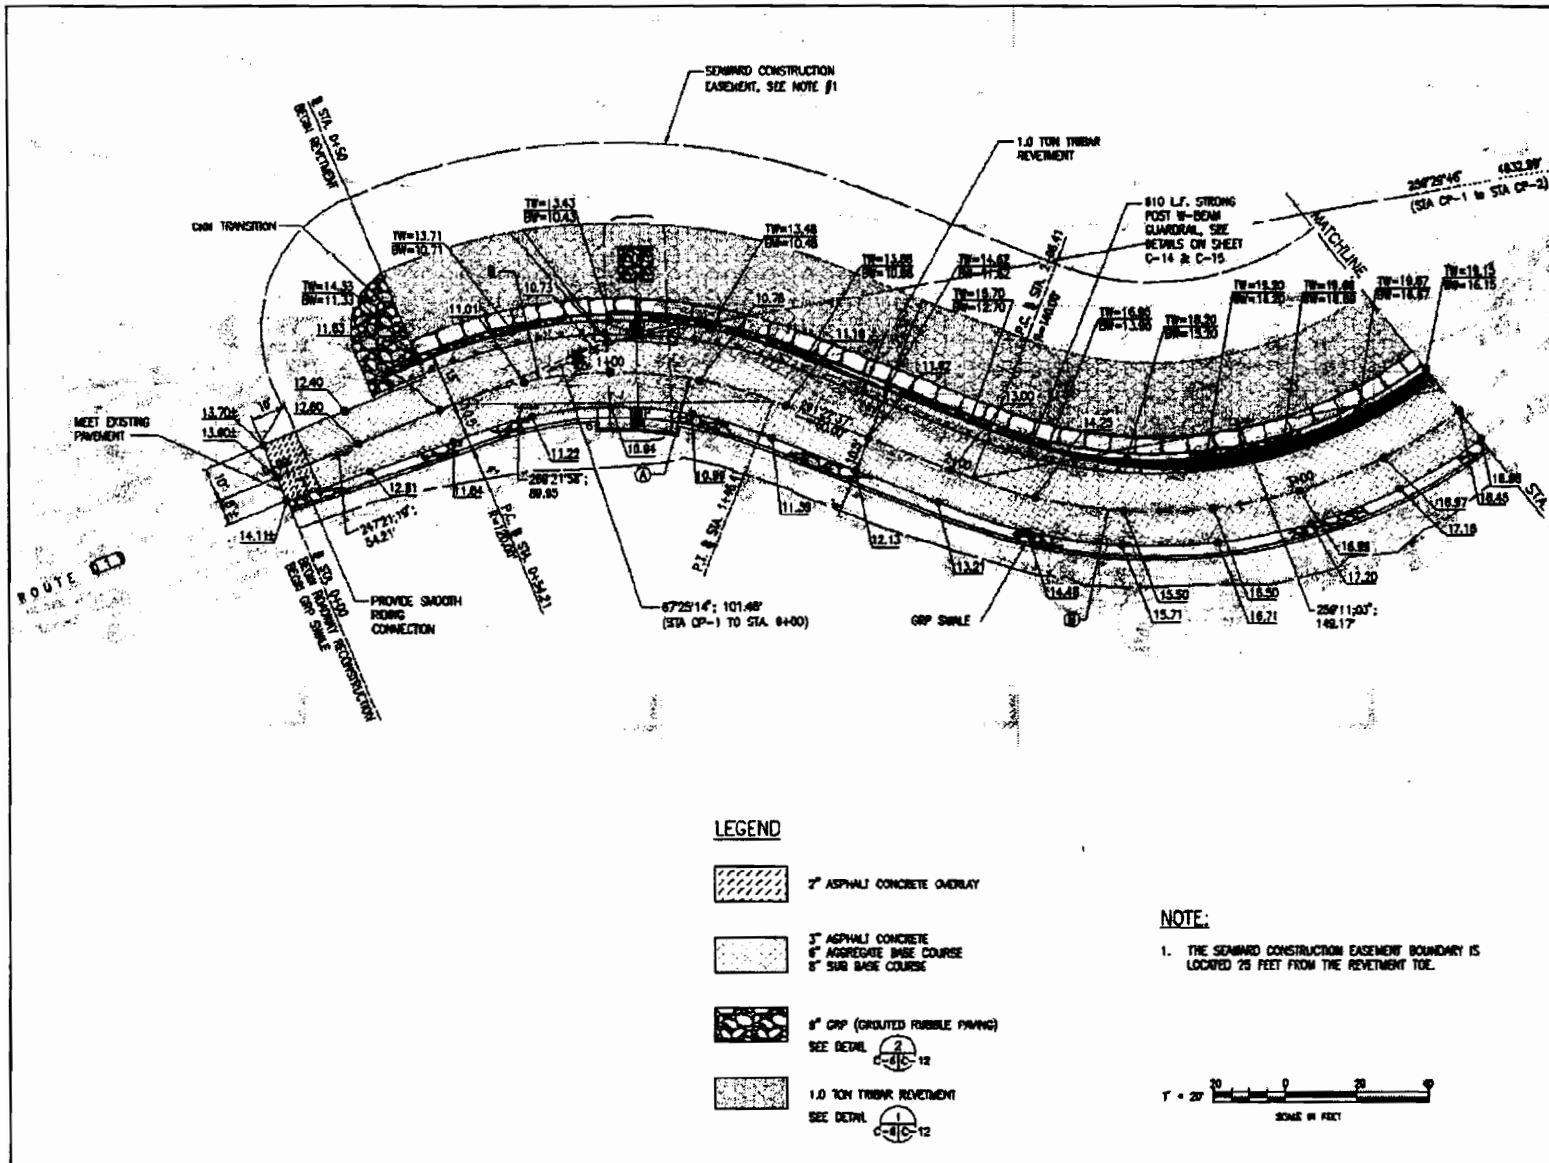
Project Plan, Sta .0+00 to Sta .3+50
